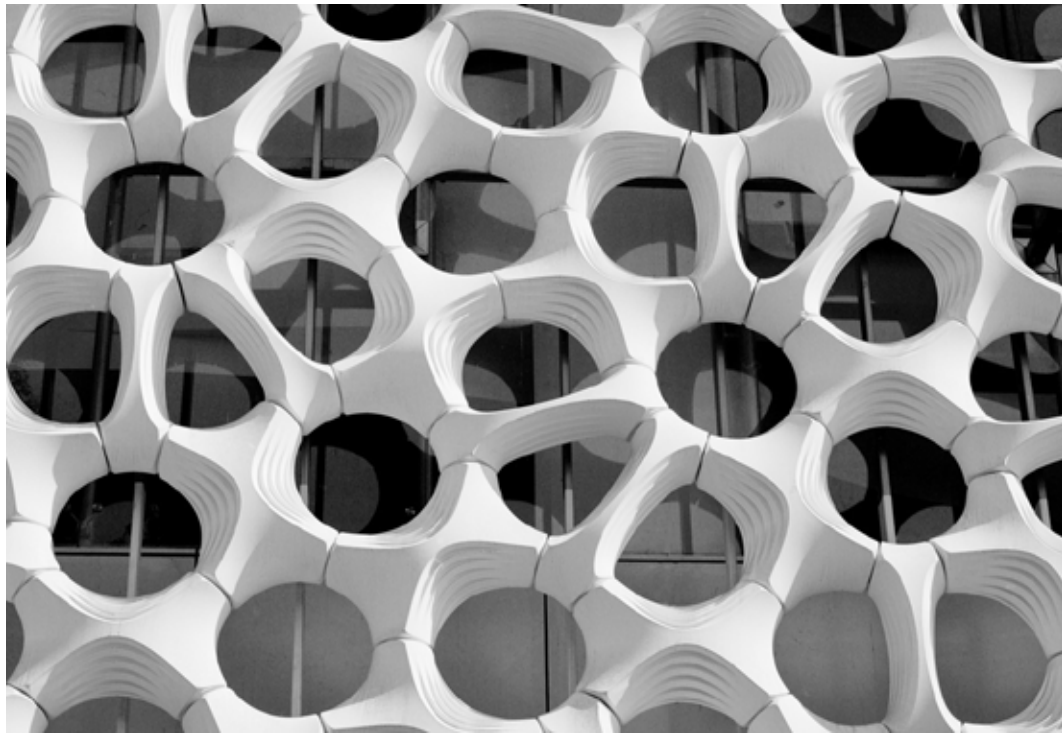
Basic facade module types "X" & "I", vacuum-formed-molded from ABS/P6 material (Elegant Embellishments)
